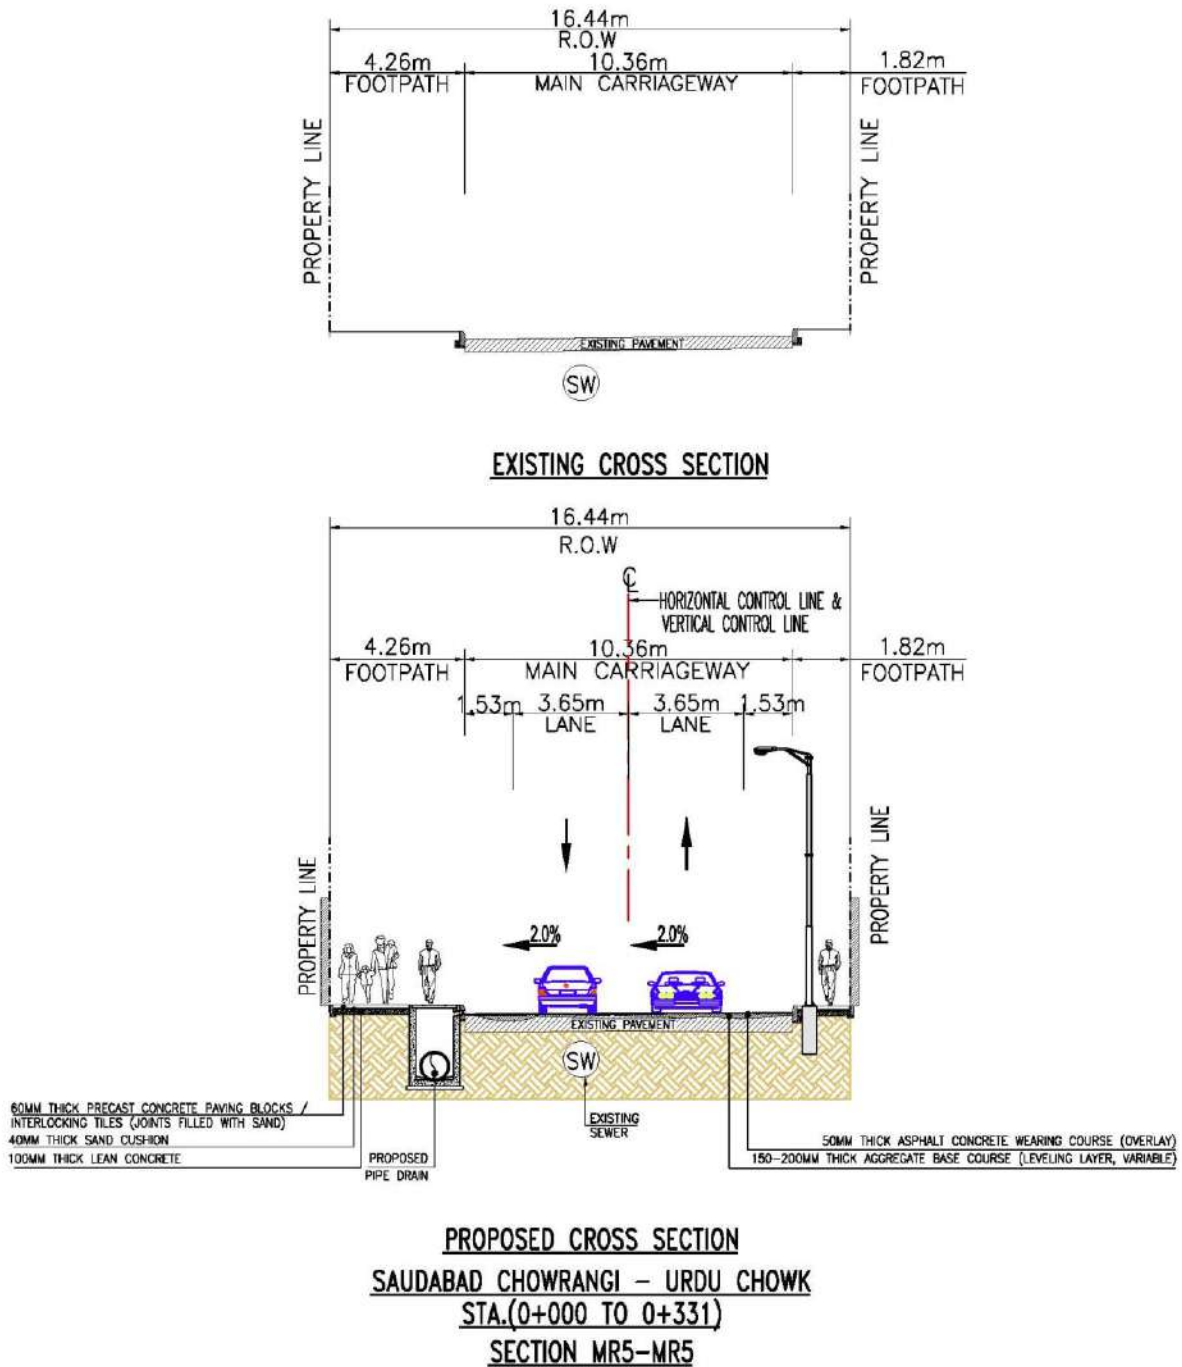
Existing and Proposed Cross Section of Saudabad Chowrangi to Urdu Chowk (0+000 to 0+331 km)
